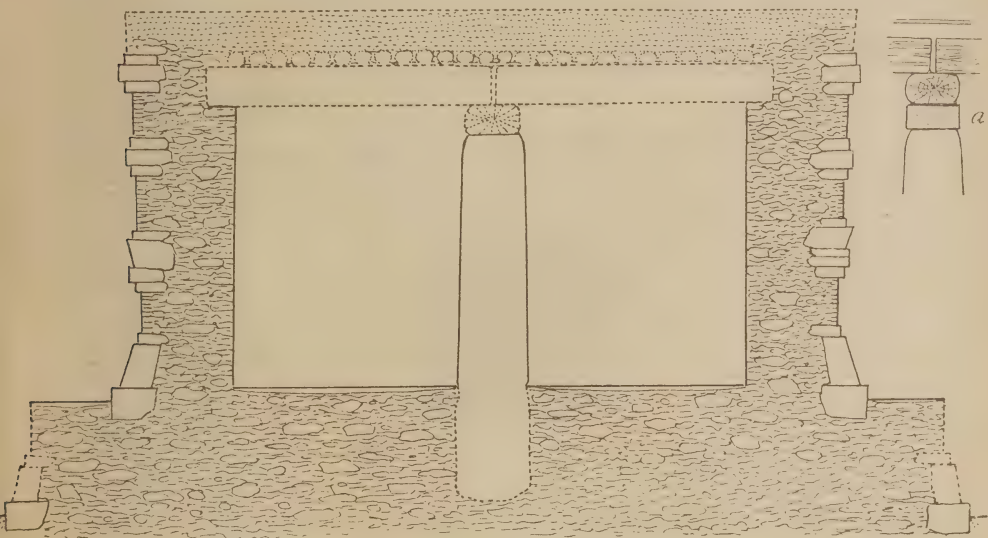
TRANSVERSE SECTION OF BUILDING OF DOUBLE BEAM SPAN.
